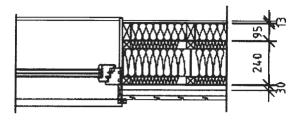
Window detailed passive-wooden wall without frame insulation (wall type 2)
